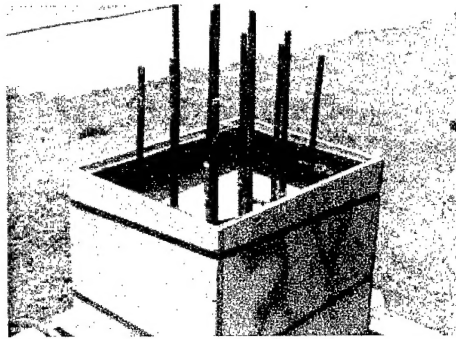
Typical fabricated concrete blocks for dry anchor installations
